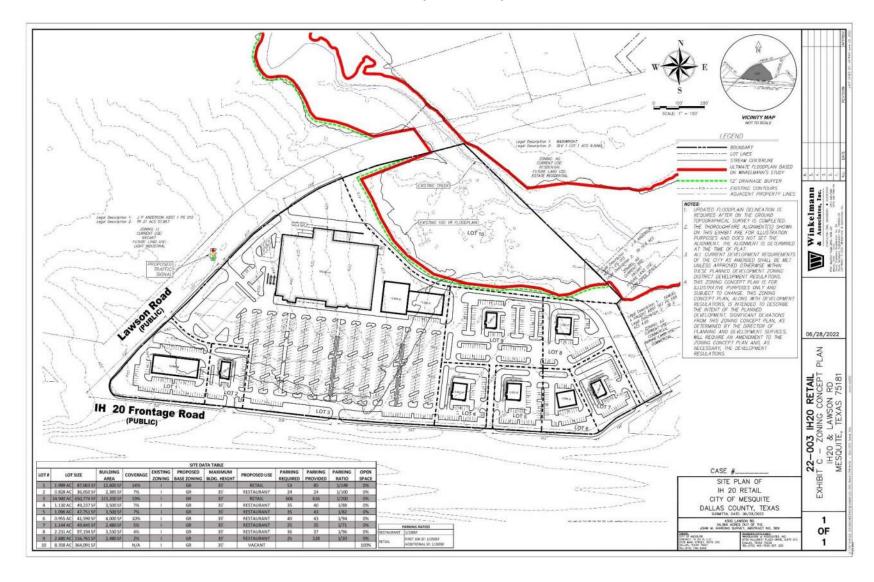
EXHIBIT D - FILE NO. Z0224-0349 CONCEPT PLAN 2 (EXISTING) NO CHANGES
